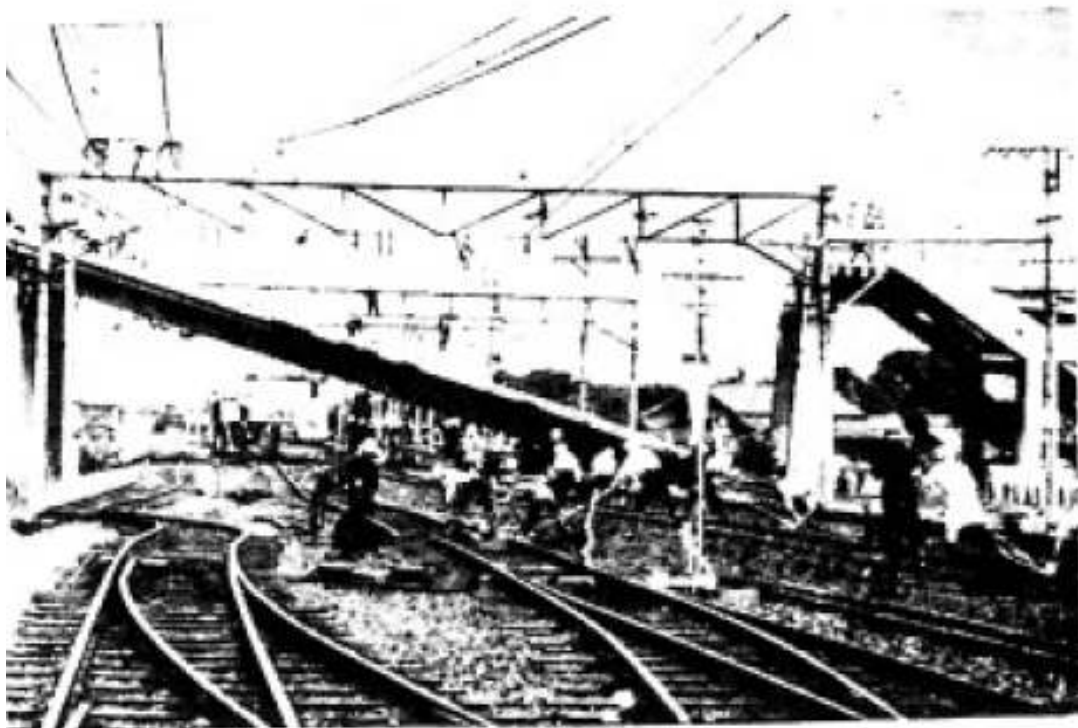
Collapse of the East Bridge over Railway (Hamada, 1986)
